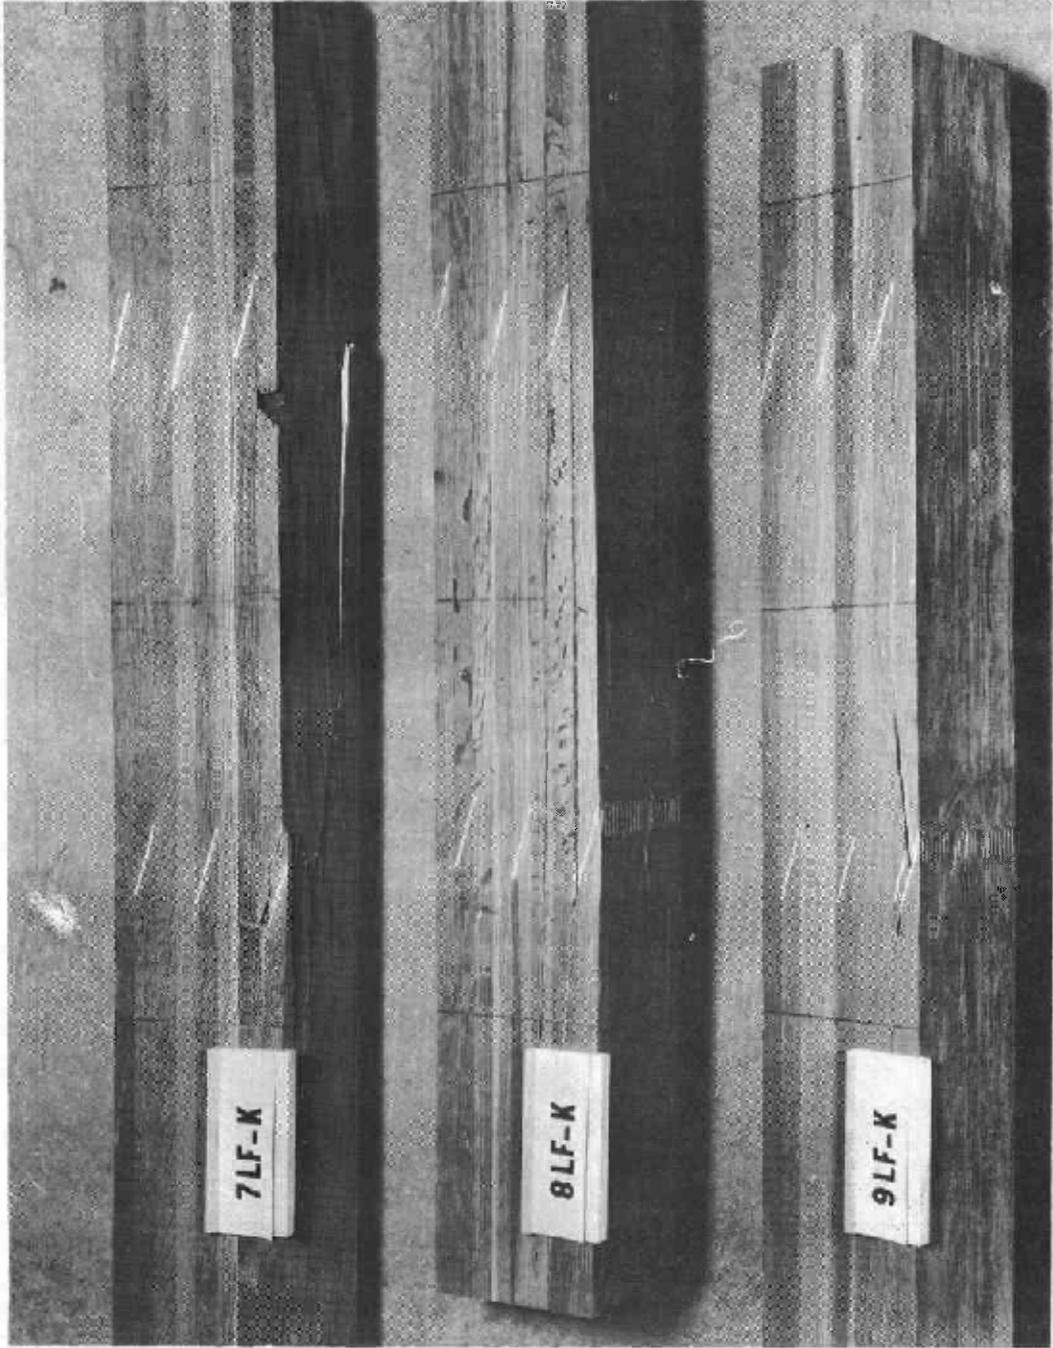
Failure of laminated keel section with serrated scarf joint of slope of 1 in 3. Typical failure is an opening of the joint in outer lamination on tension side followed by simple or splintering tension.
